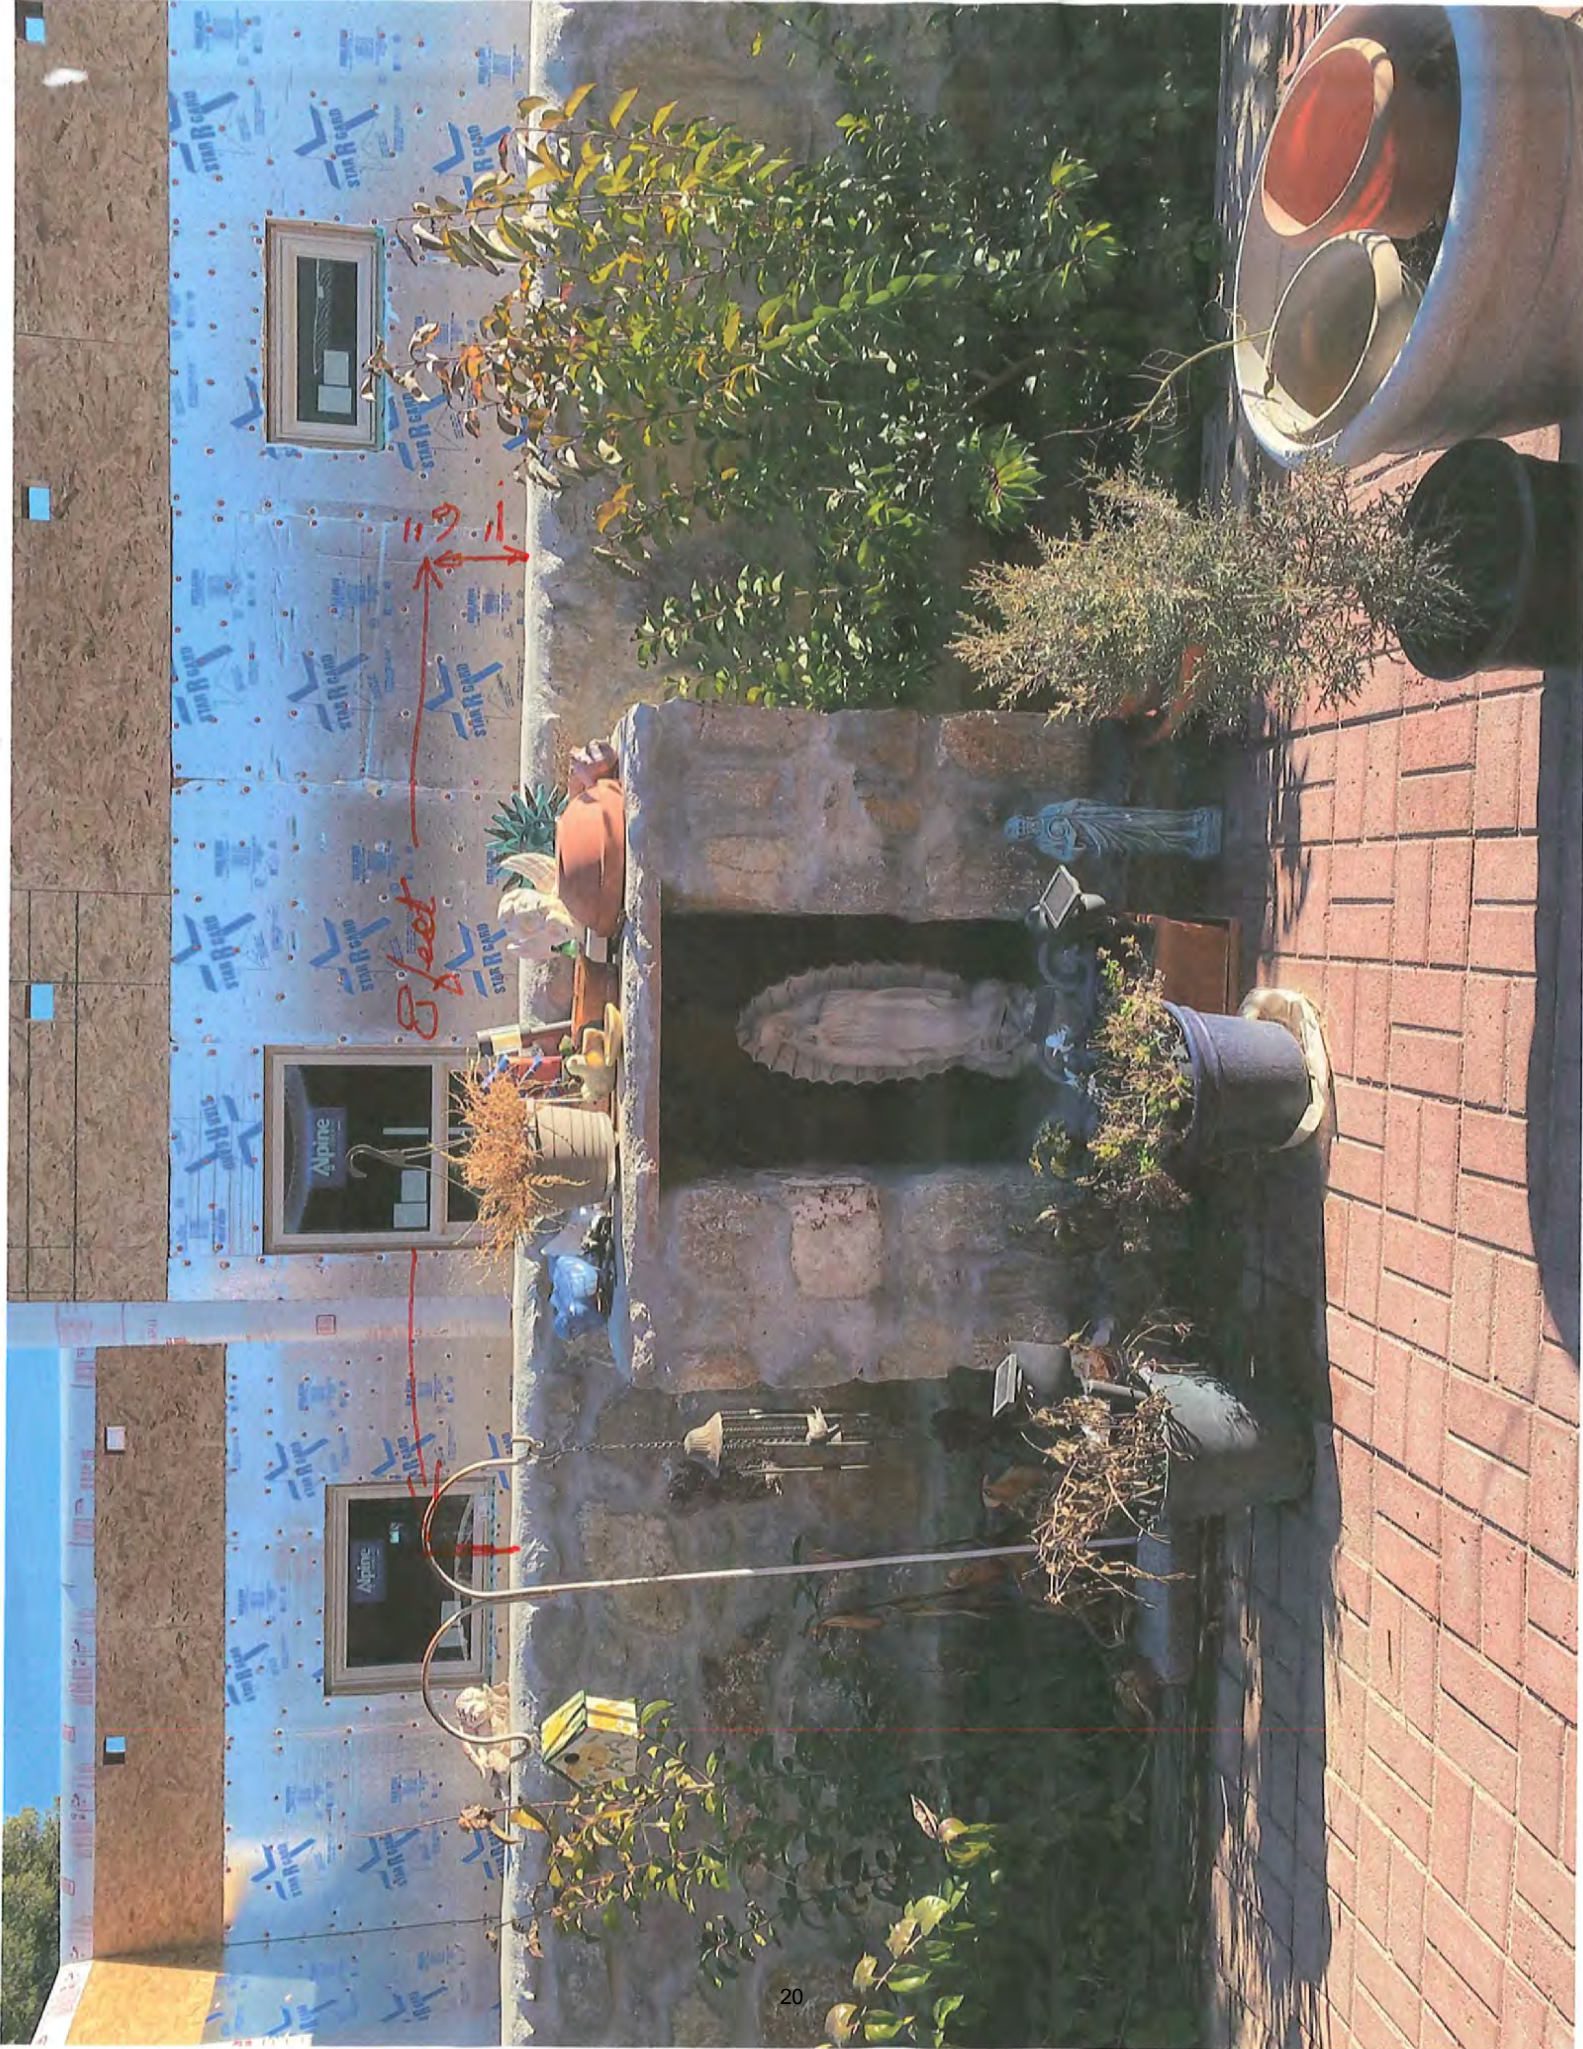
PHOTO OF THE SUBJECT DWELLING FROM CALLE DE COLON
